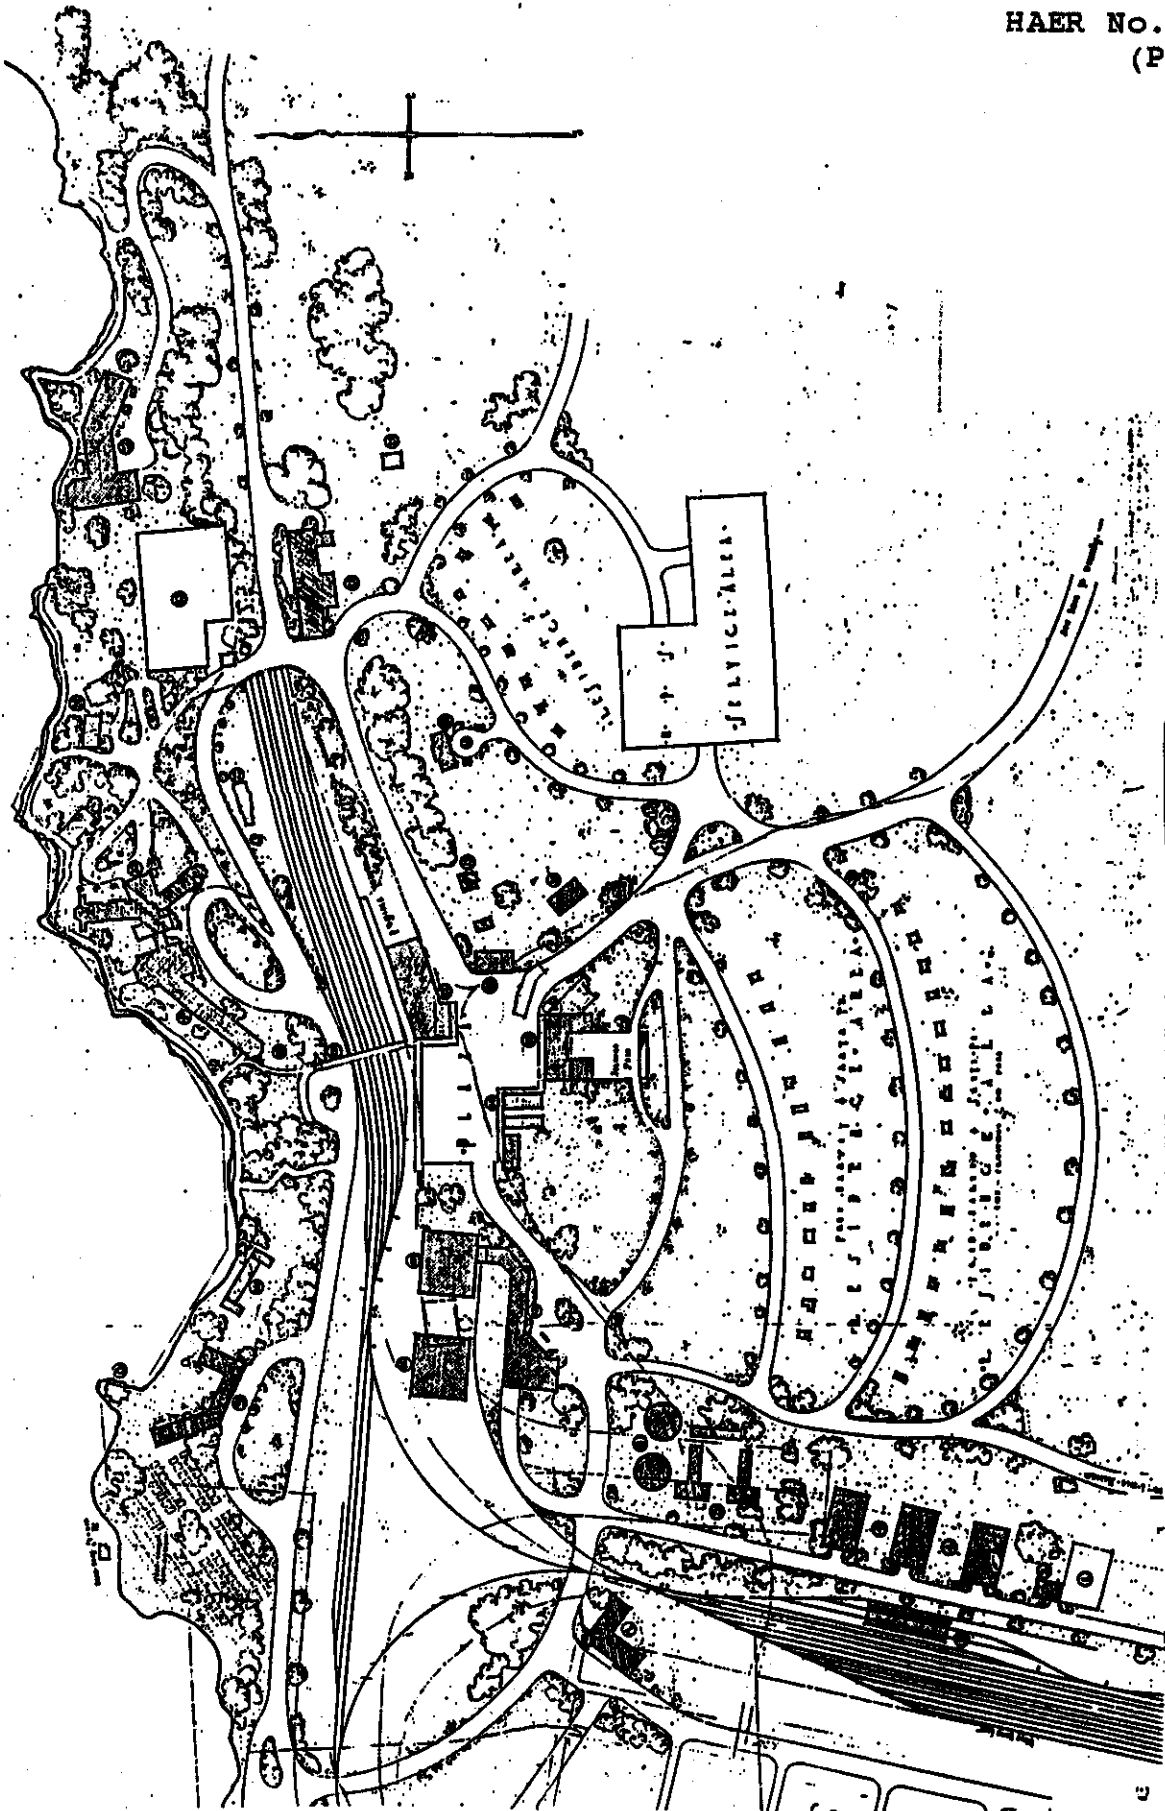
Design architect's conception of Grand Canyon Village, from the 1924 Master Plan. Note the plaza area and planned south entrance road. (GCNP, Professional Services)
